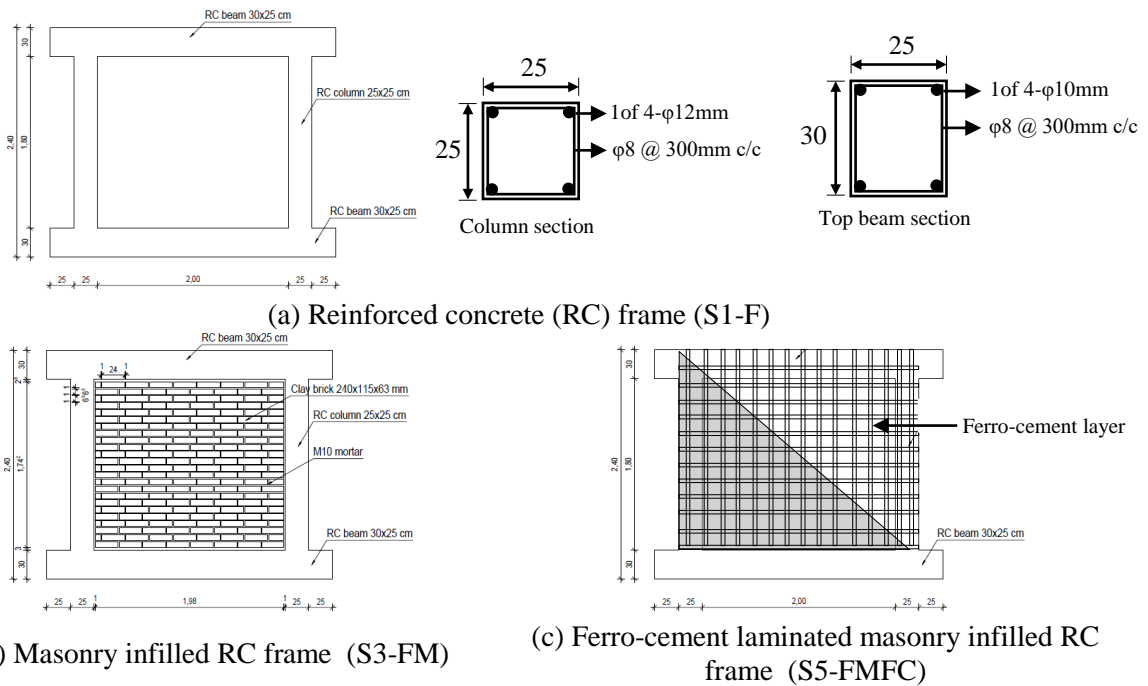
Dimension and reinforcement detailing of test specimens (*dimensions are in cm*)
